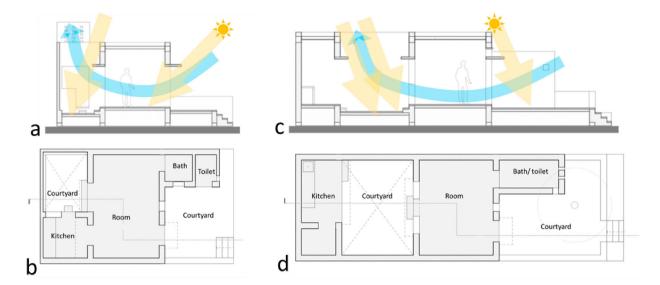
Co-design_03: (a) Section, (b) Plan; Co-design_04: (c) Section, (d) Plan.
